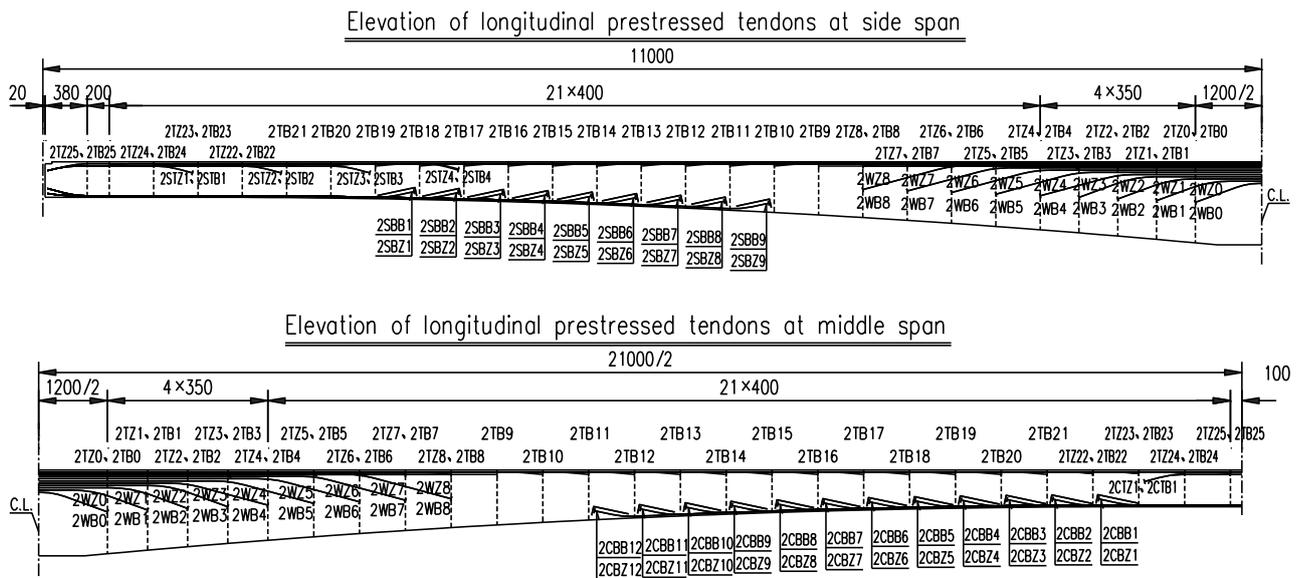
Layout Diagram of Longitudinal prestressed Tendons in the Girder (Unit: cm)
